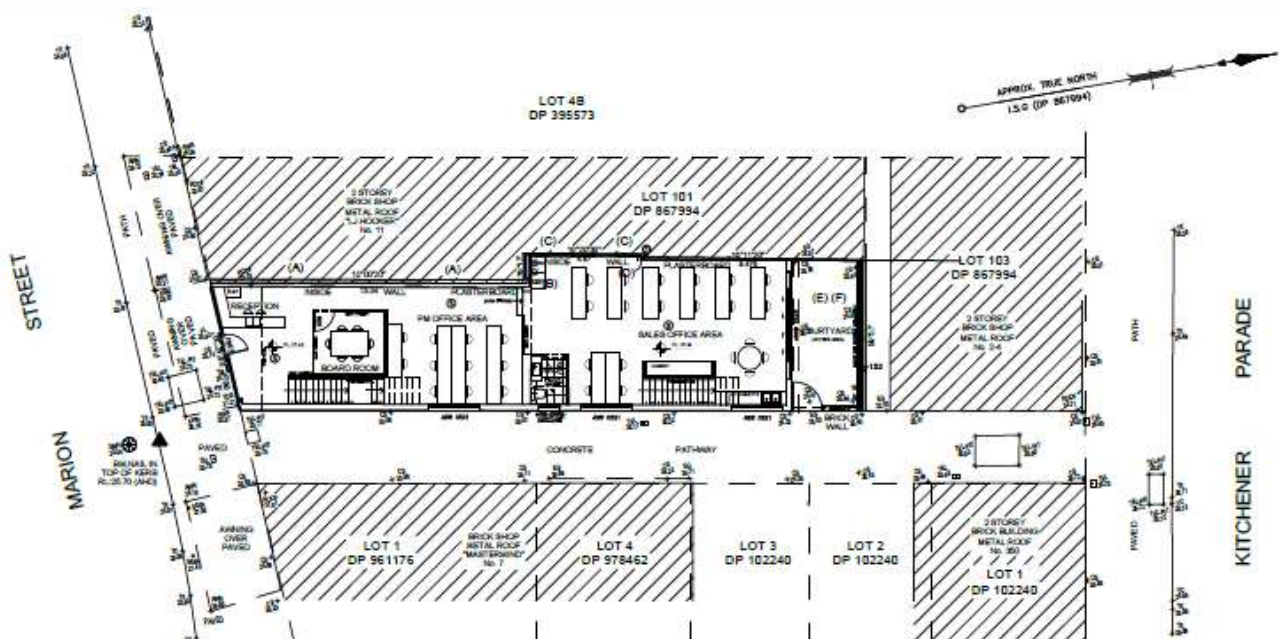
Site Plan of 9 Marion Street, Bankstown (Inkon Plans)
